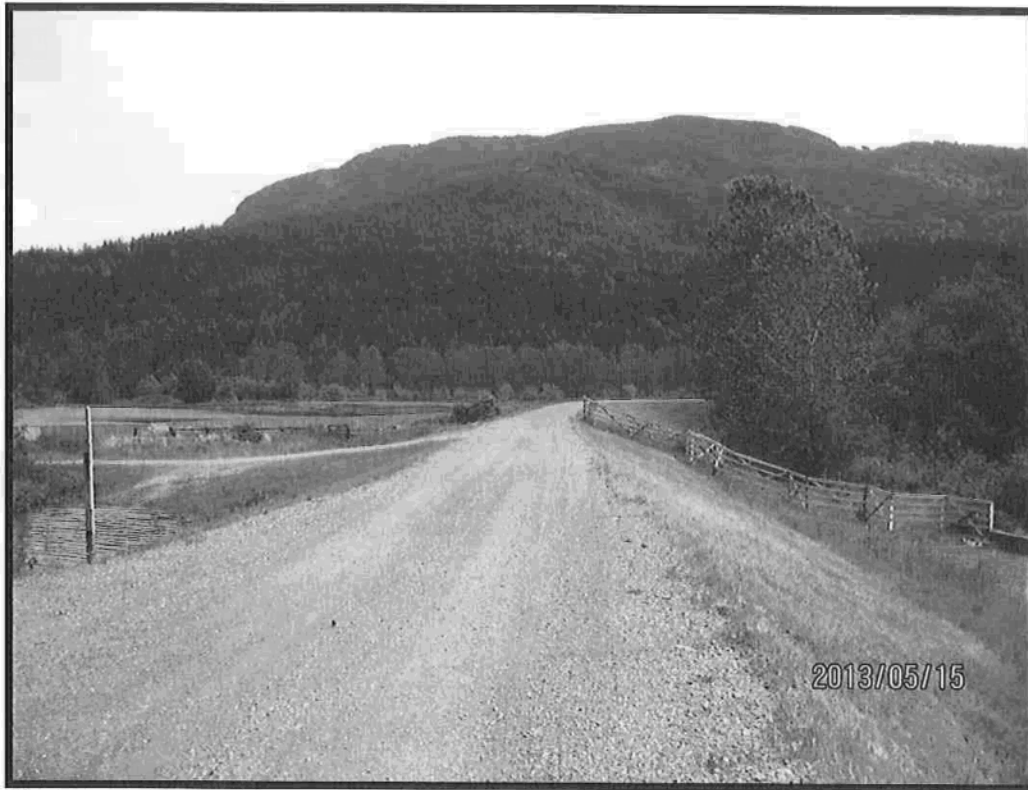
Looking northwest at Dike C from Station 53+00 (Limbert Road). (May 15, 2013)
